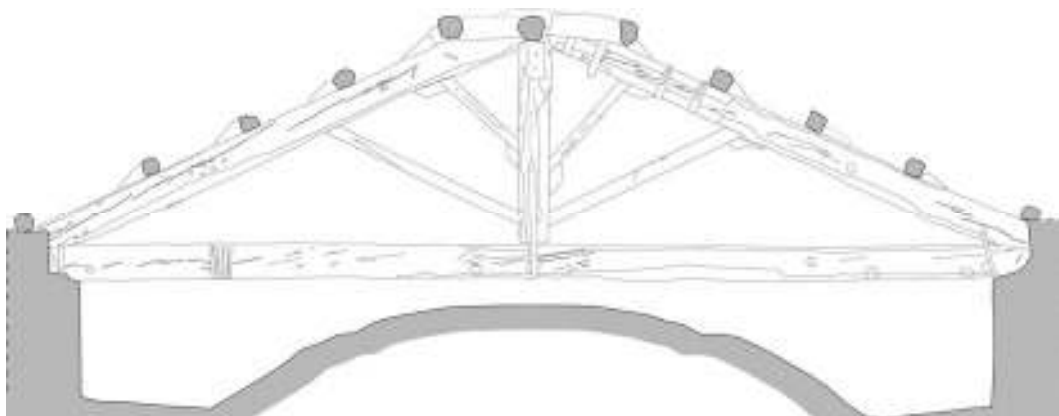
Northern façade of truss 5 (M. Bosi, A. Cernuschi, E. Doria, P. Pilan).
